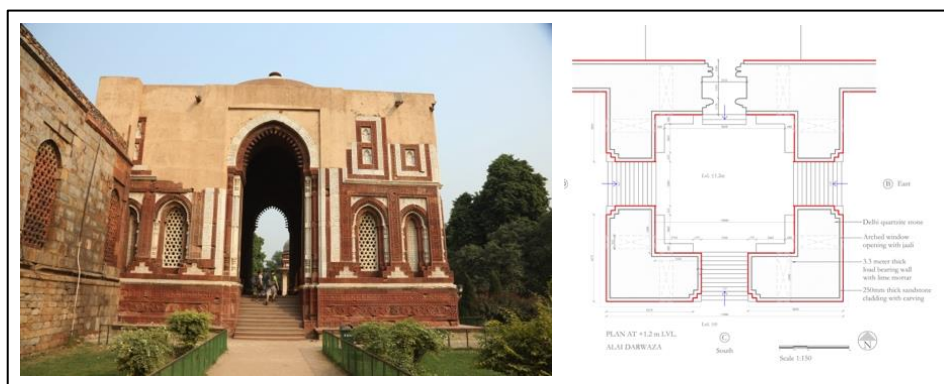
A view of Alai Darwaza (left) and floor plan (right).
